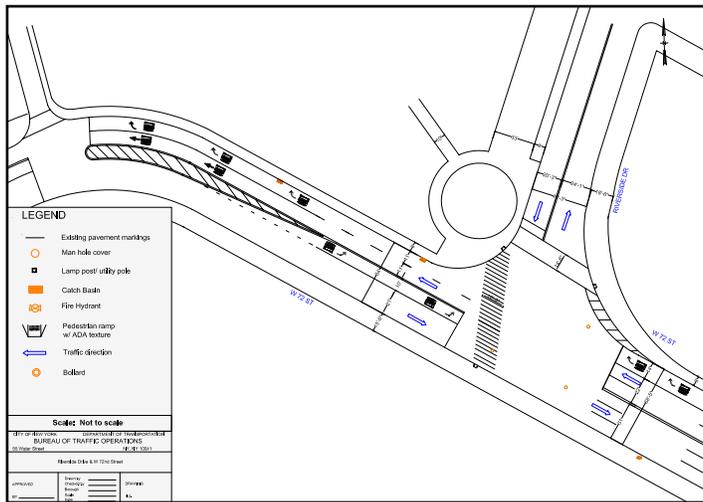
Existing Condition - Riverside Drive & West 72nd Street
